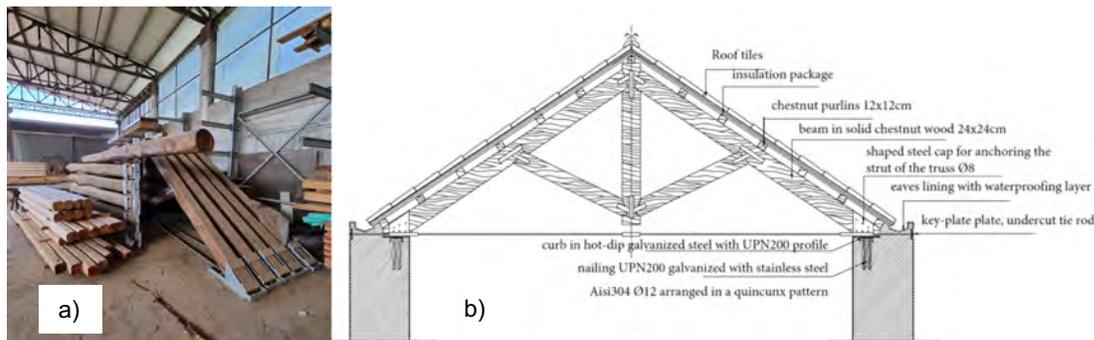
Timber trusses. a) Factory storage b) cross-section picture (Source: Authors 2022)
